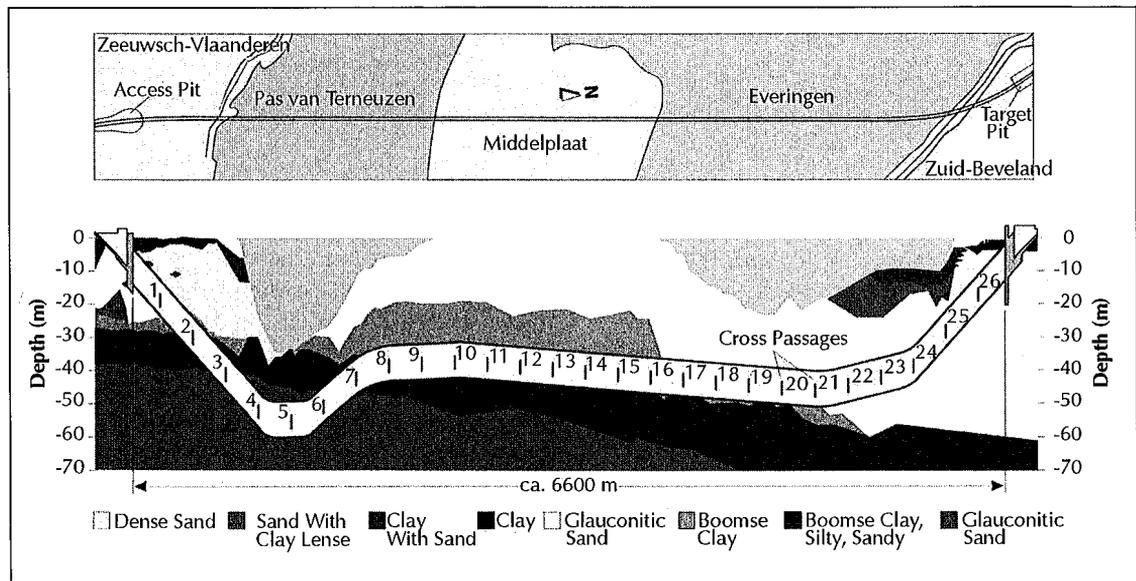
Longitudinal section and geology for the Westerscheldetunnel project.
